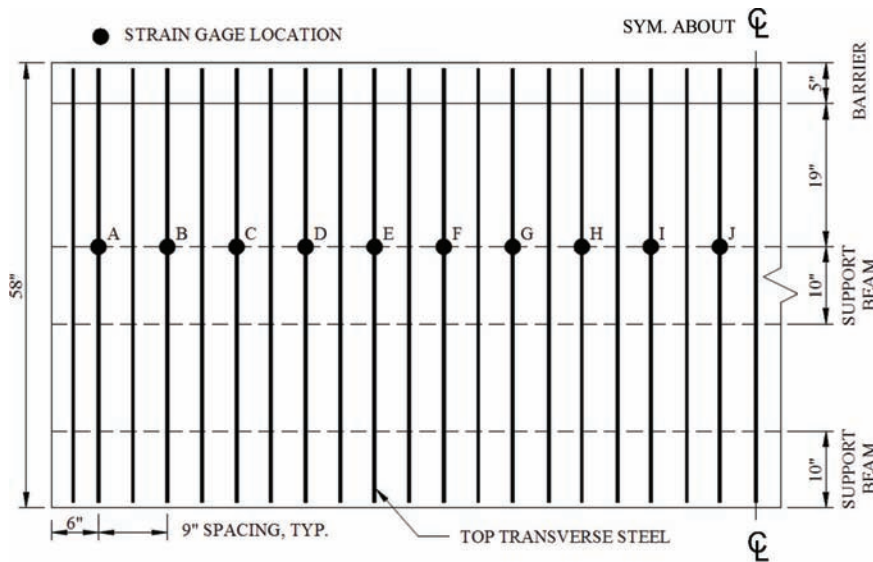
Specimen 1 strain gage instrumentation (plan view).
